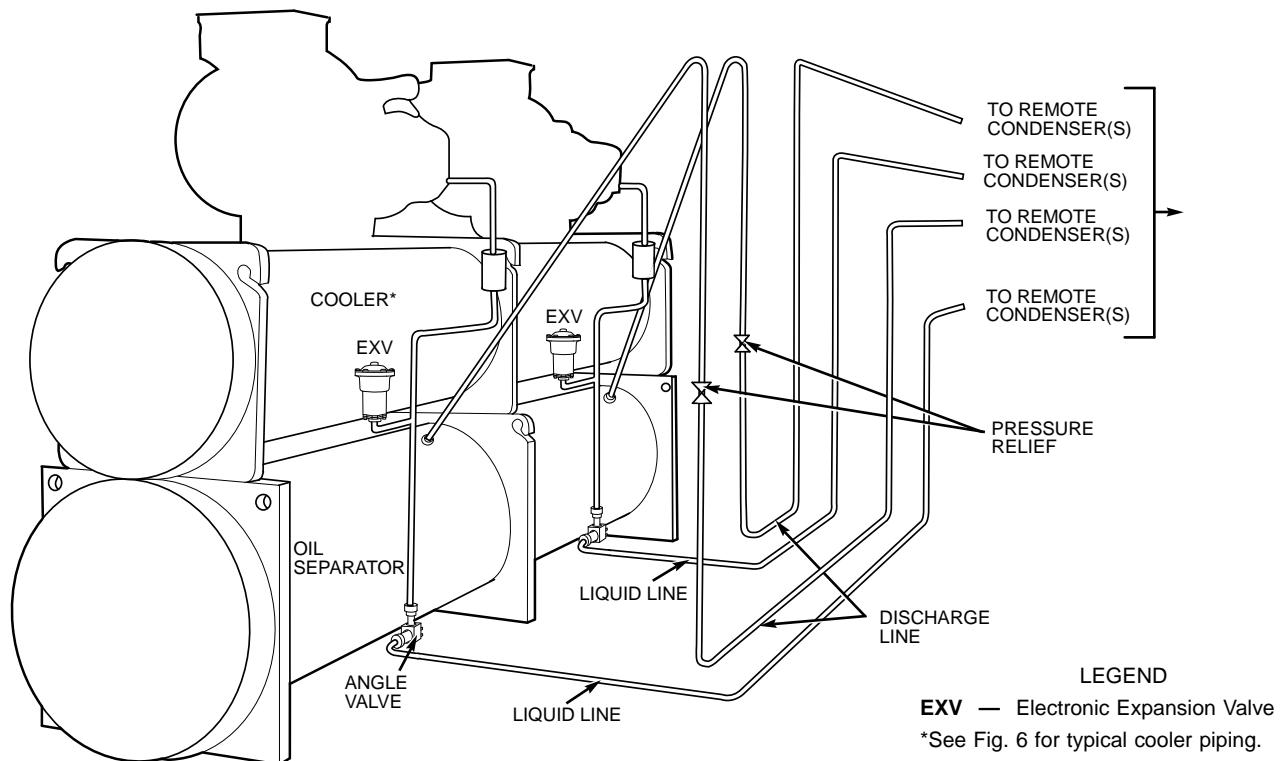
Typical 30HXA Refrigerant Piping to Remote Condenser
